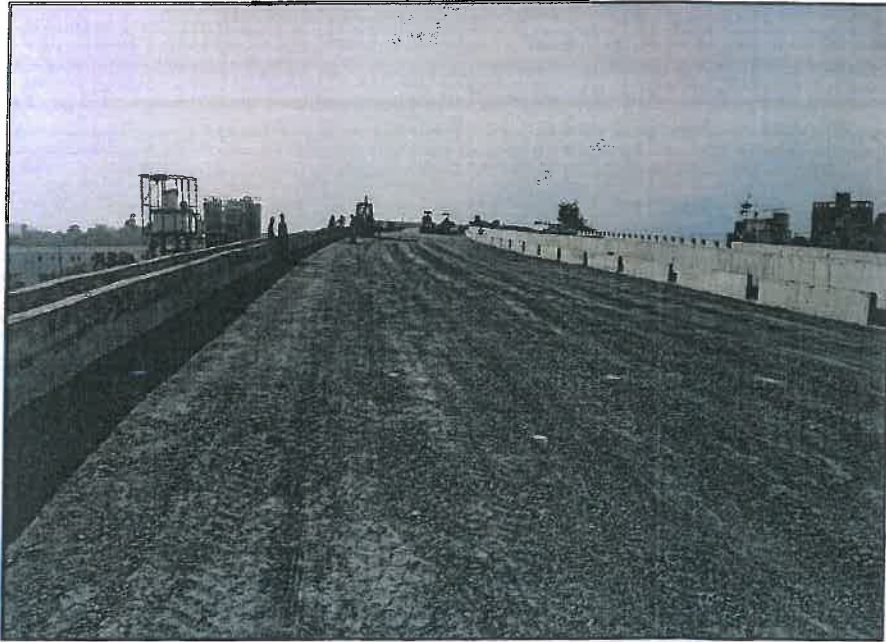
GSB laying work at RHS CH 18+930 to 19+070.
